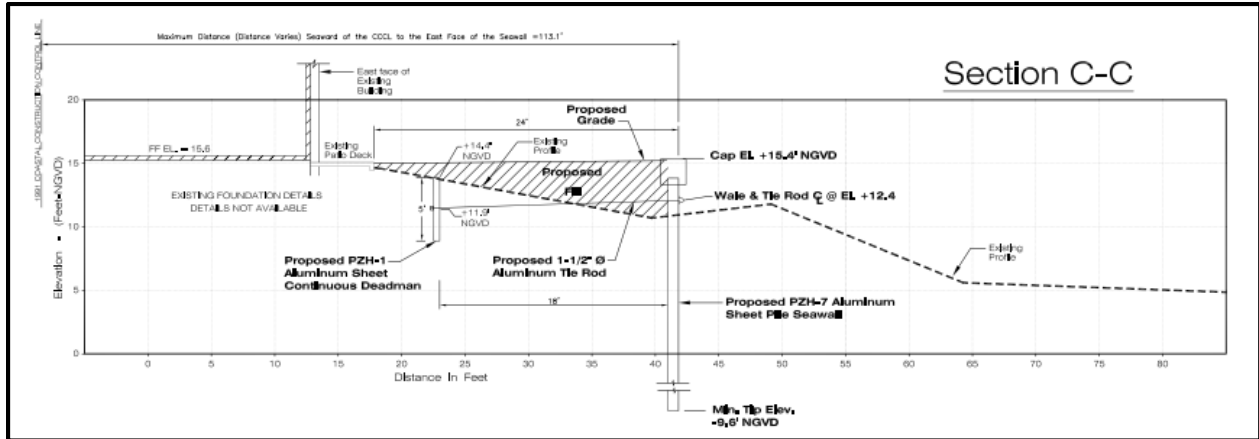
Typical Cross-Section: Seawall with Tie-rod & Deadman
